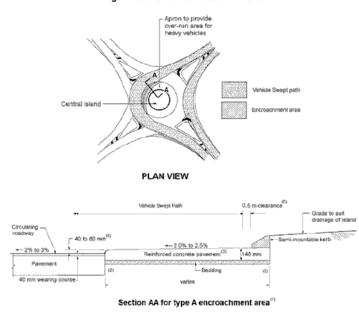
Typical Roundabout Layout and Encroachment Area
